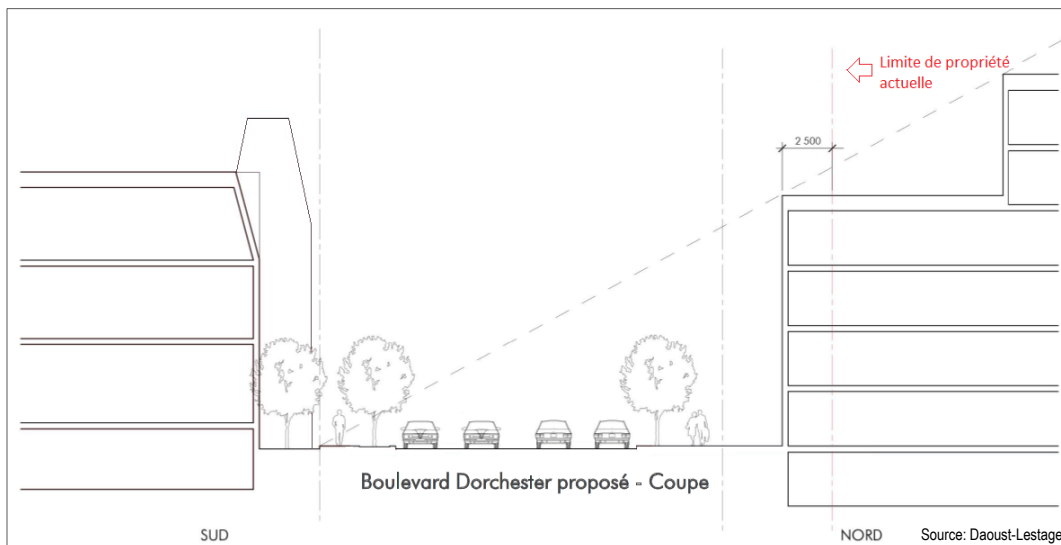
Typical cross-section of the buildings proposed on Dorchester Boulevard
